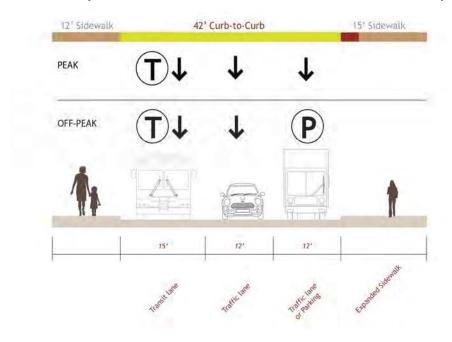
Proposed Cross Section for Columbia Street and Marion Street Transit Couplet
